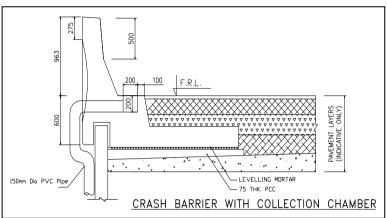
I: TYPICAL DETAIL OF CRASH BARRIER WITH COLLECTION CHAMBER, AS ADOPTED ON NH2, PACKAGE IIA, GQ
